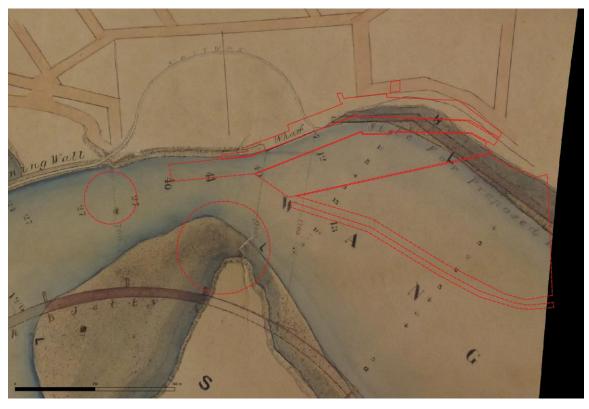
Detail of 1890 Hardy Johnston plan of the Mouth of the Wanganui River showing Proposed Piers
